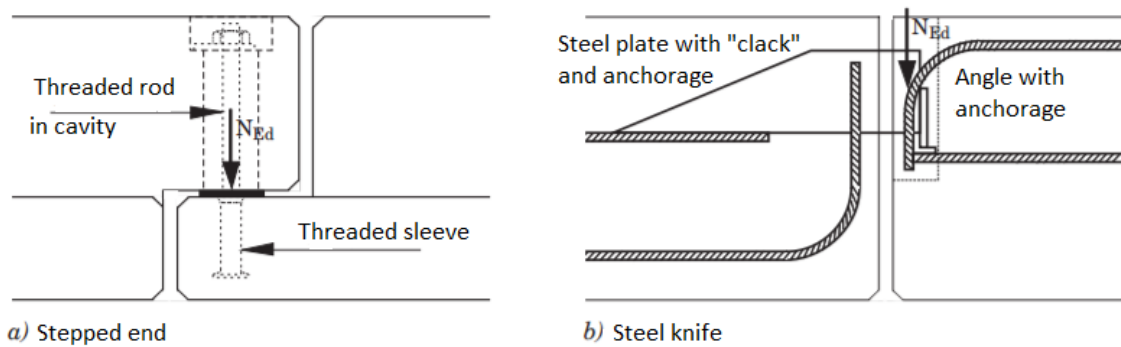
Examples of joints in continuous beams at zero moment [3]
